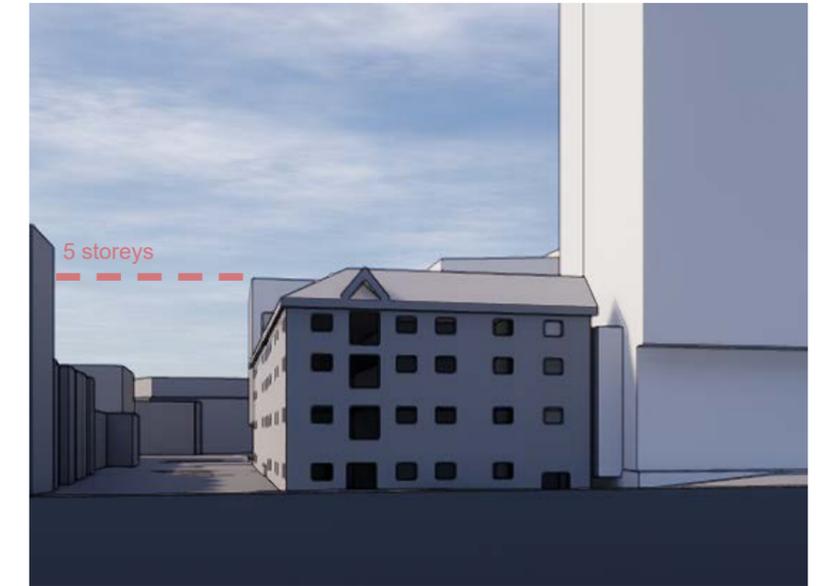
View A. Granary Building from Bank Place with 5 storey building to SE Quarter
